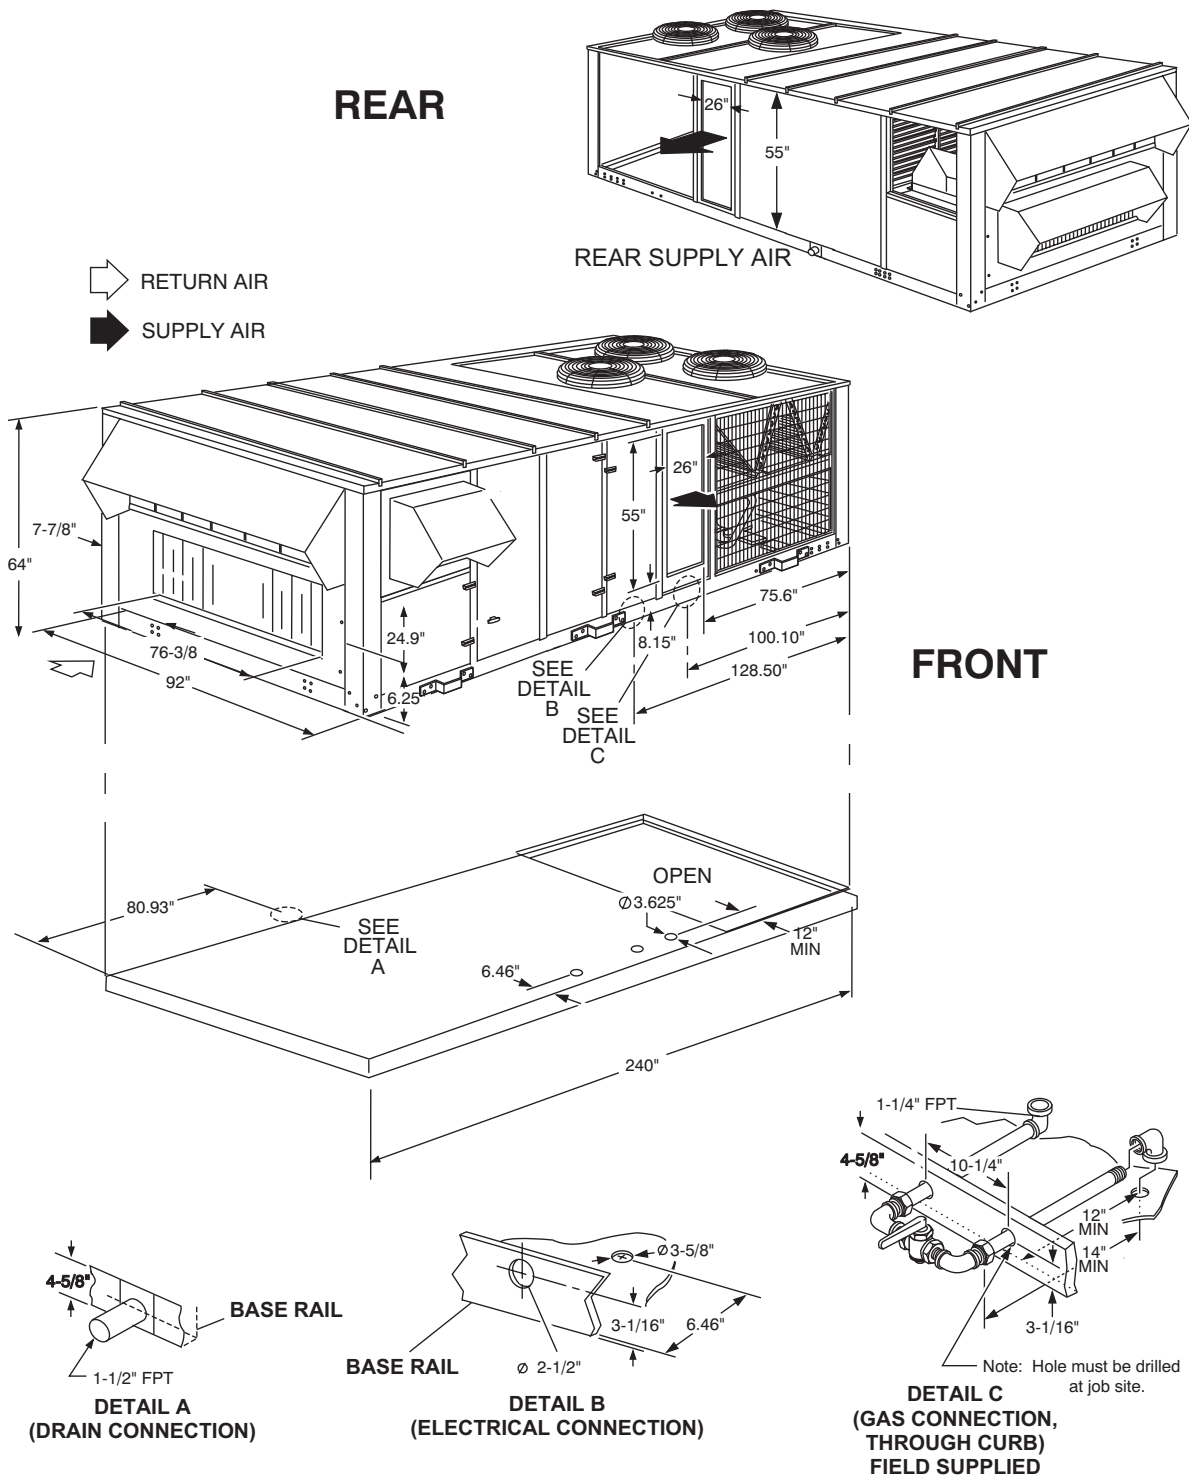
END RETURN, FRONT & REAR SUPPLY
